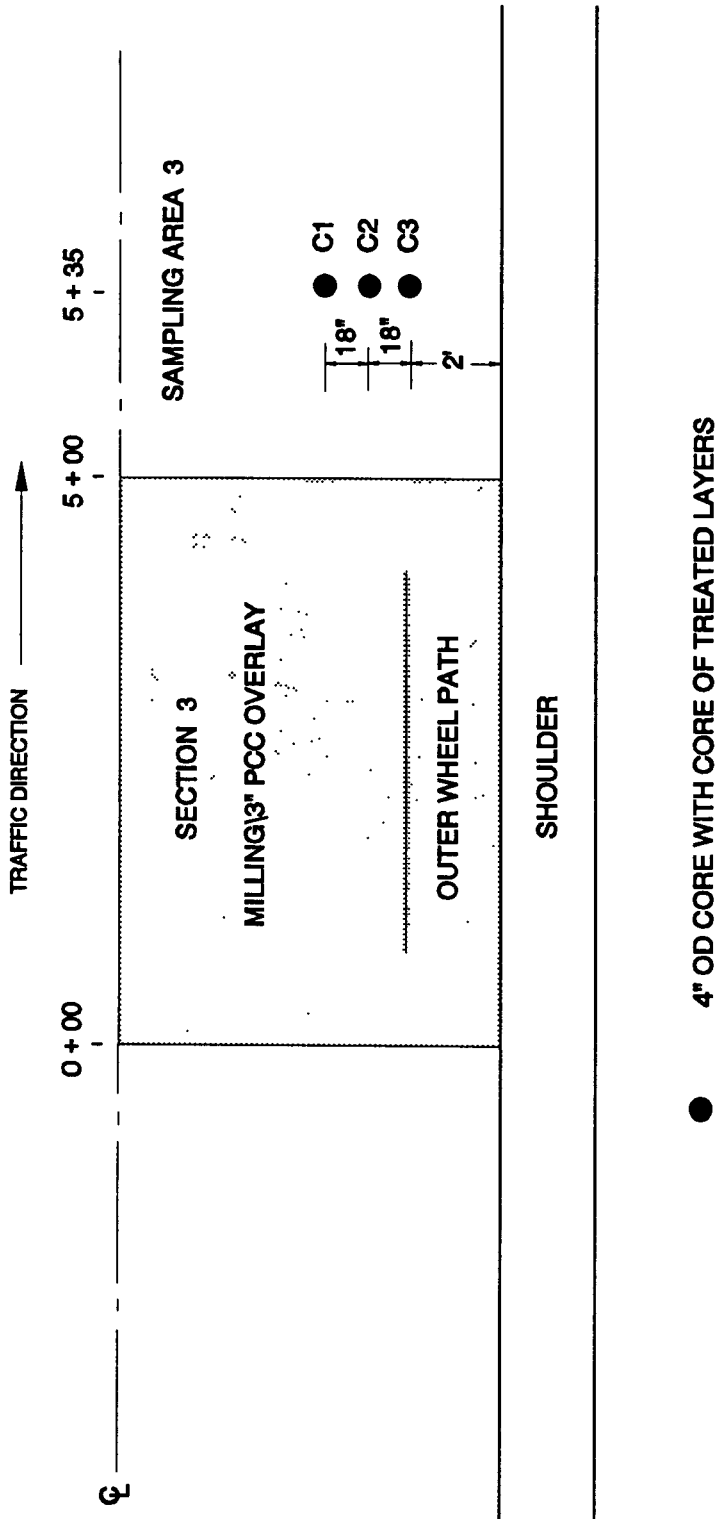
Example of "Pre-Construction" Sampling Plan for Test Section 3
